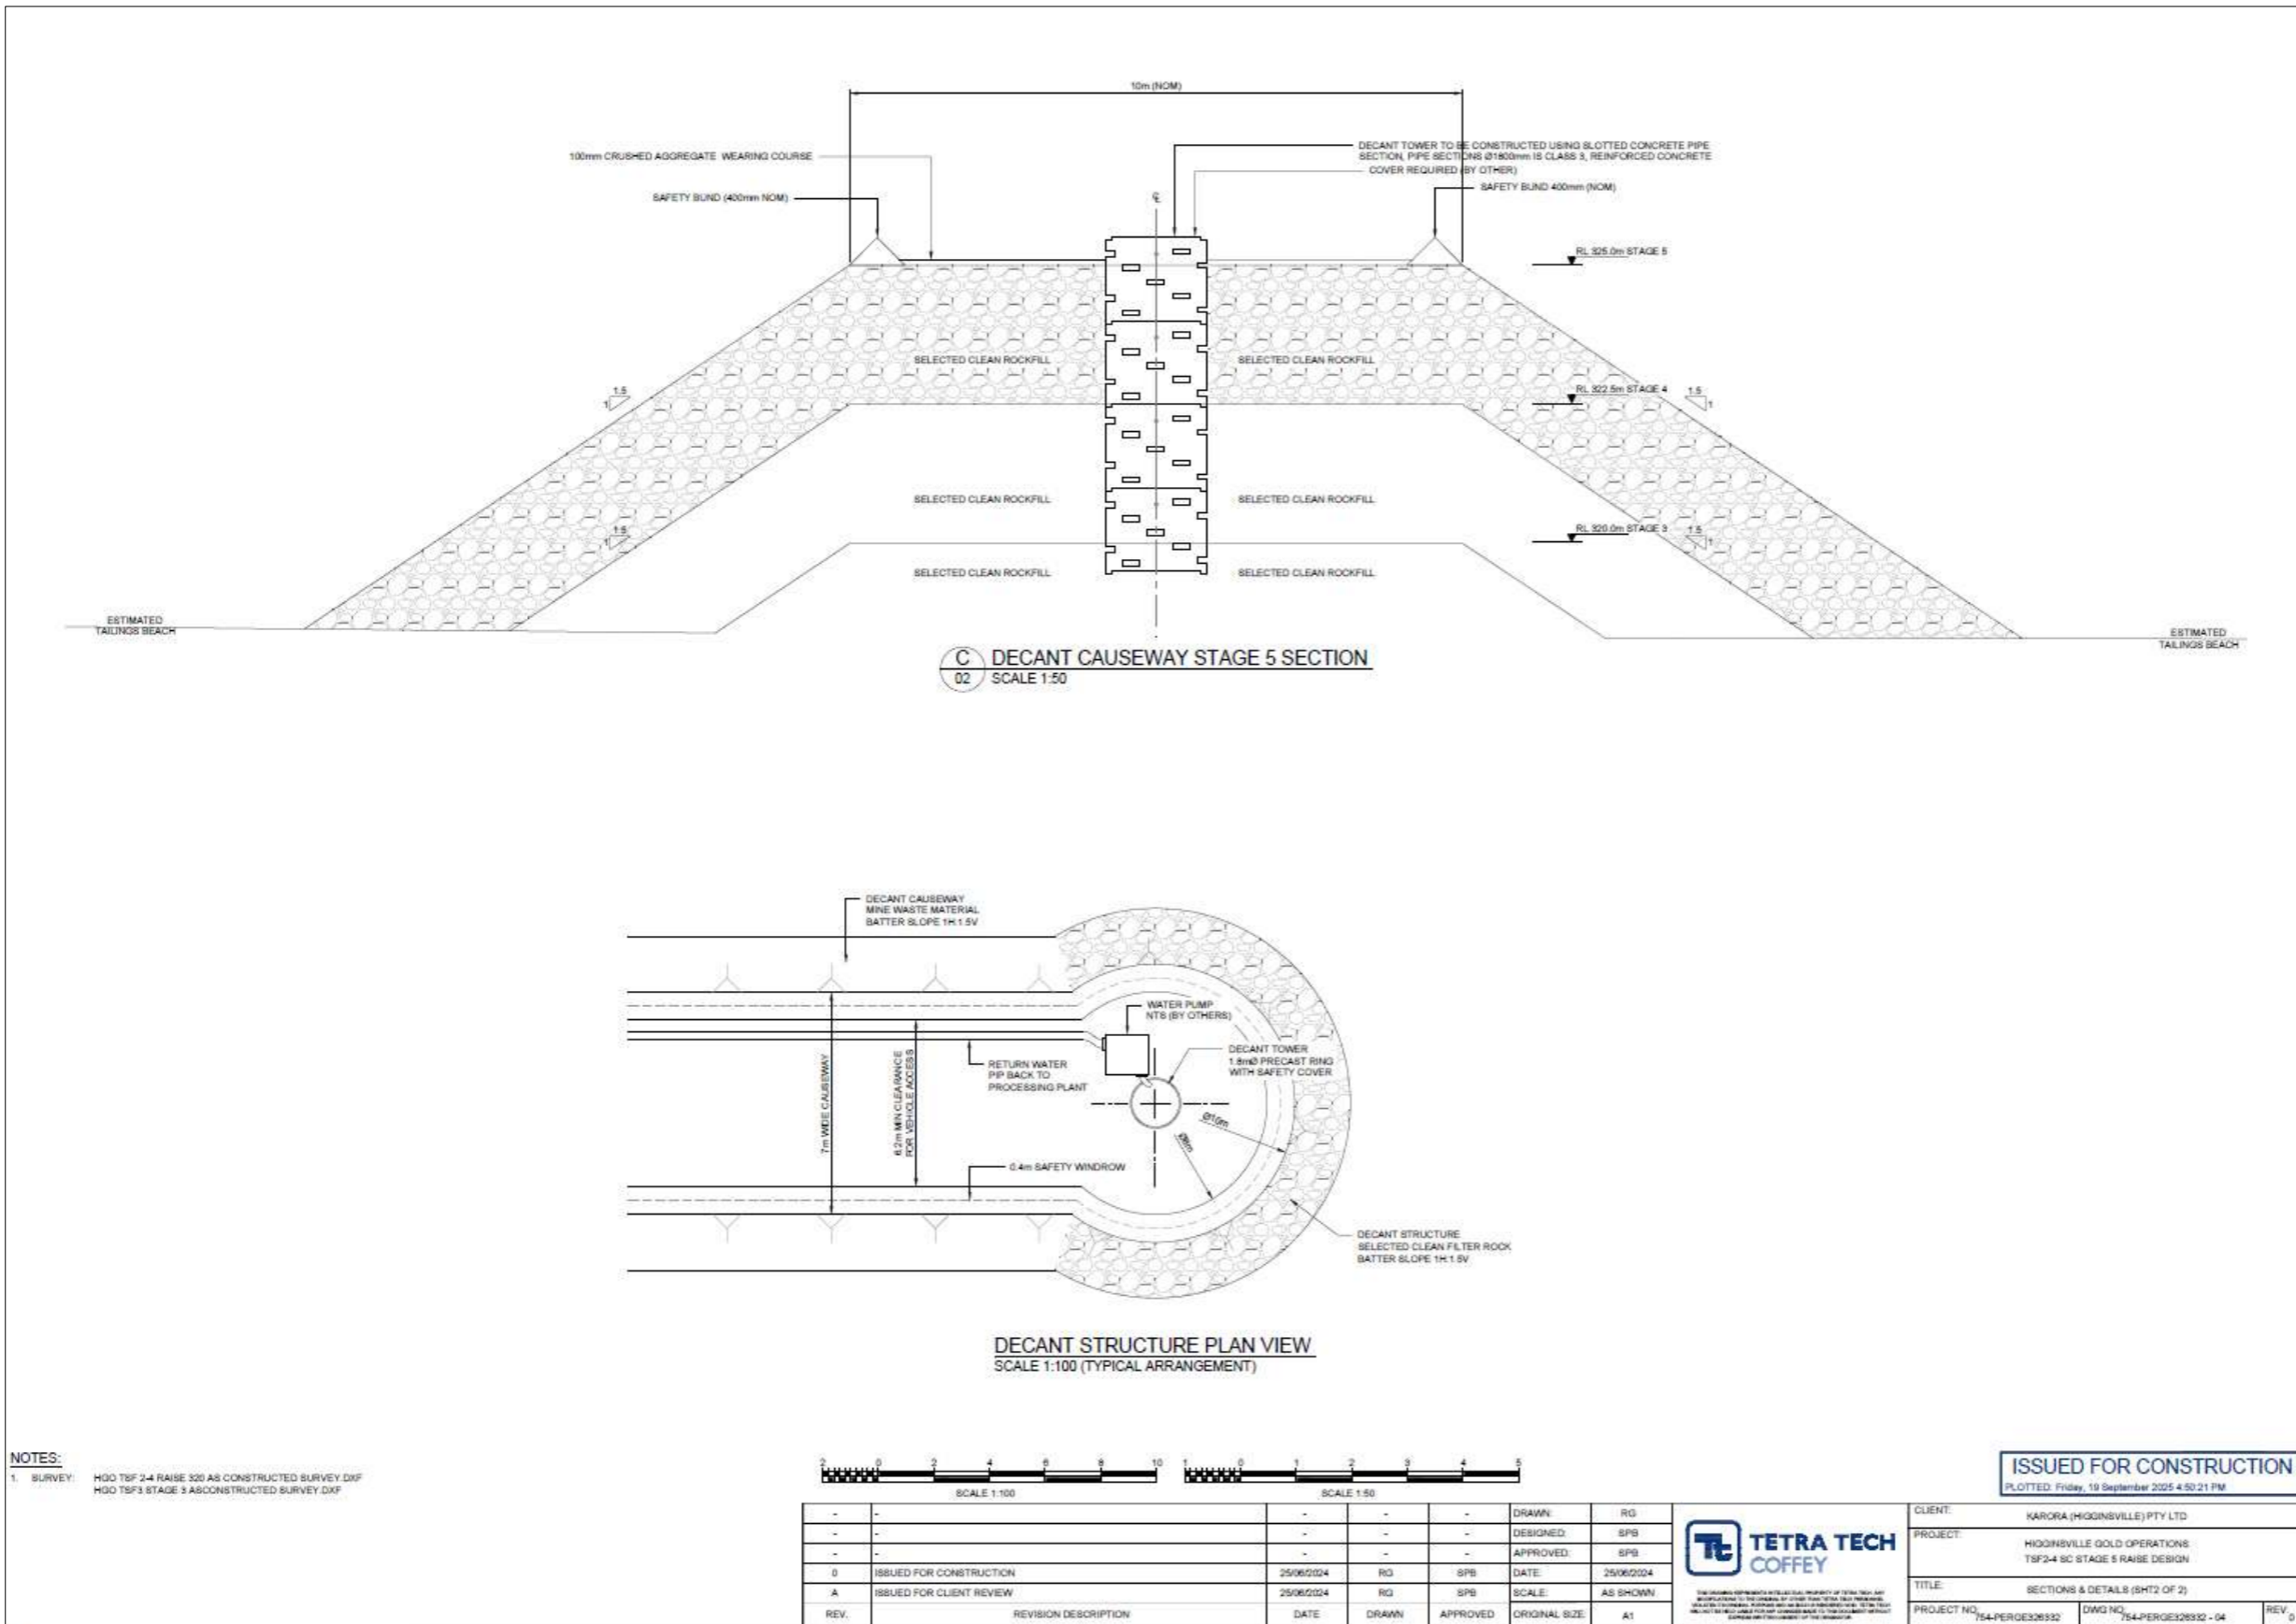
TSF2-4 Stage 5 embankment raise - decant infrastructure detail
